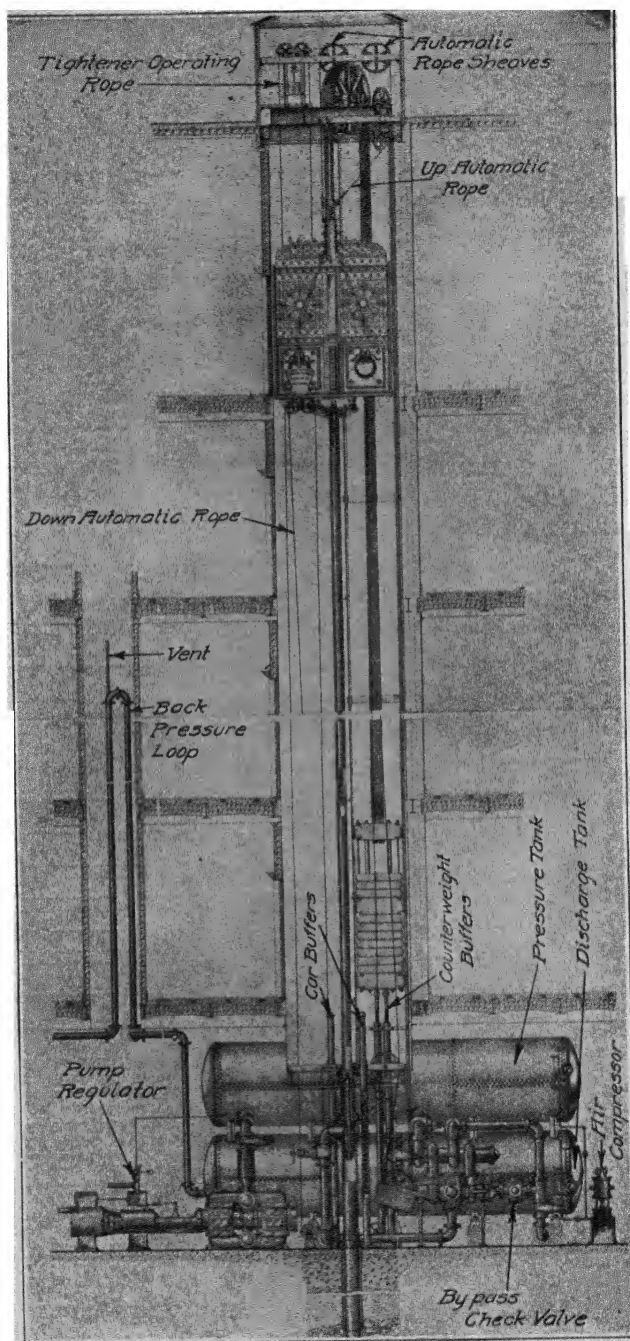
Vertical Section of Typical Back-Pressure Loop Elevator Installation
